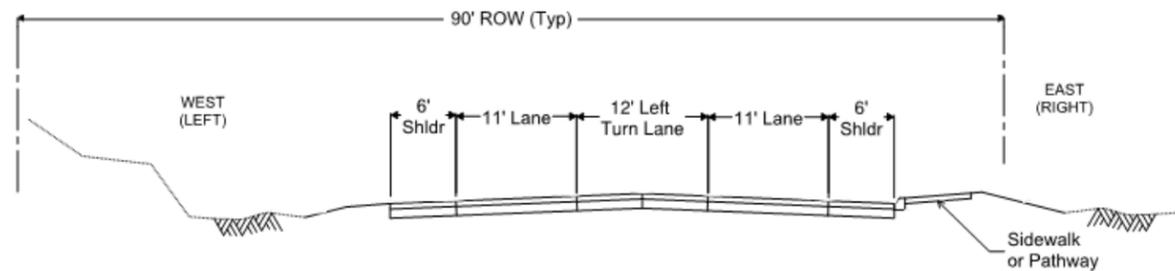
Pedestrian Facilities, East Side Only – Typical Section
